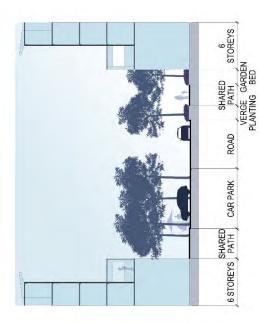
Daly Street (Plan Extract and Indicative Section)
